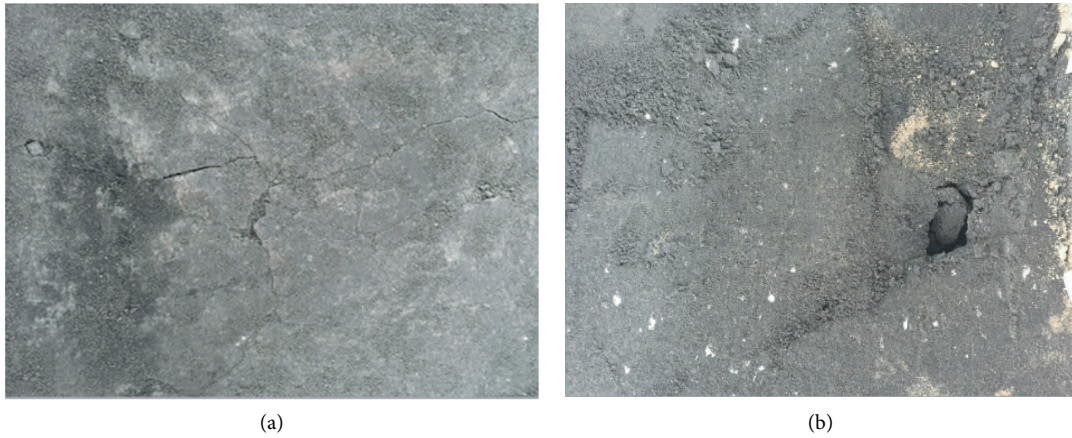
Test 2 cracks after blasting. (a) Test 2 cracks formed after blasting. (b) Test 2 cavity zone formed after blasting.
